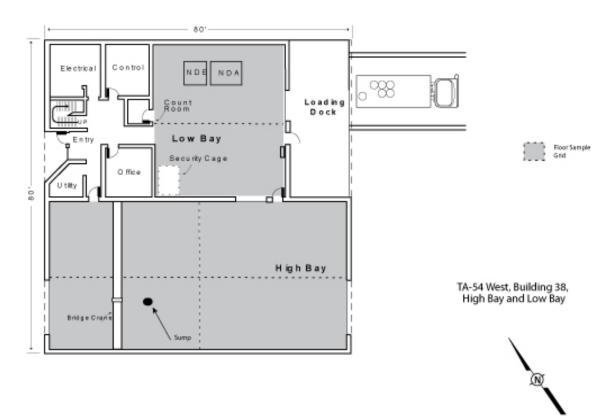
Technical Area 54, Building 38 (High, Low Bay, and Loading Dock Sampling Locations)
